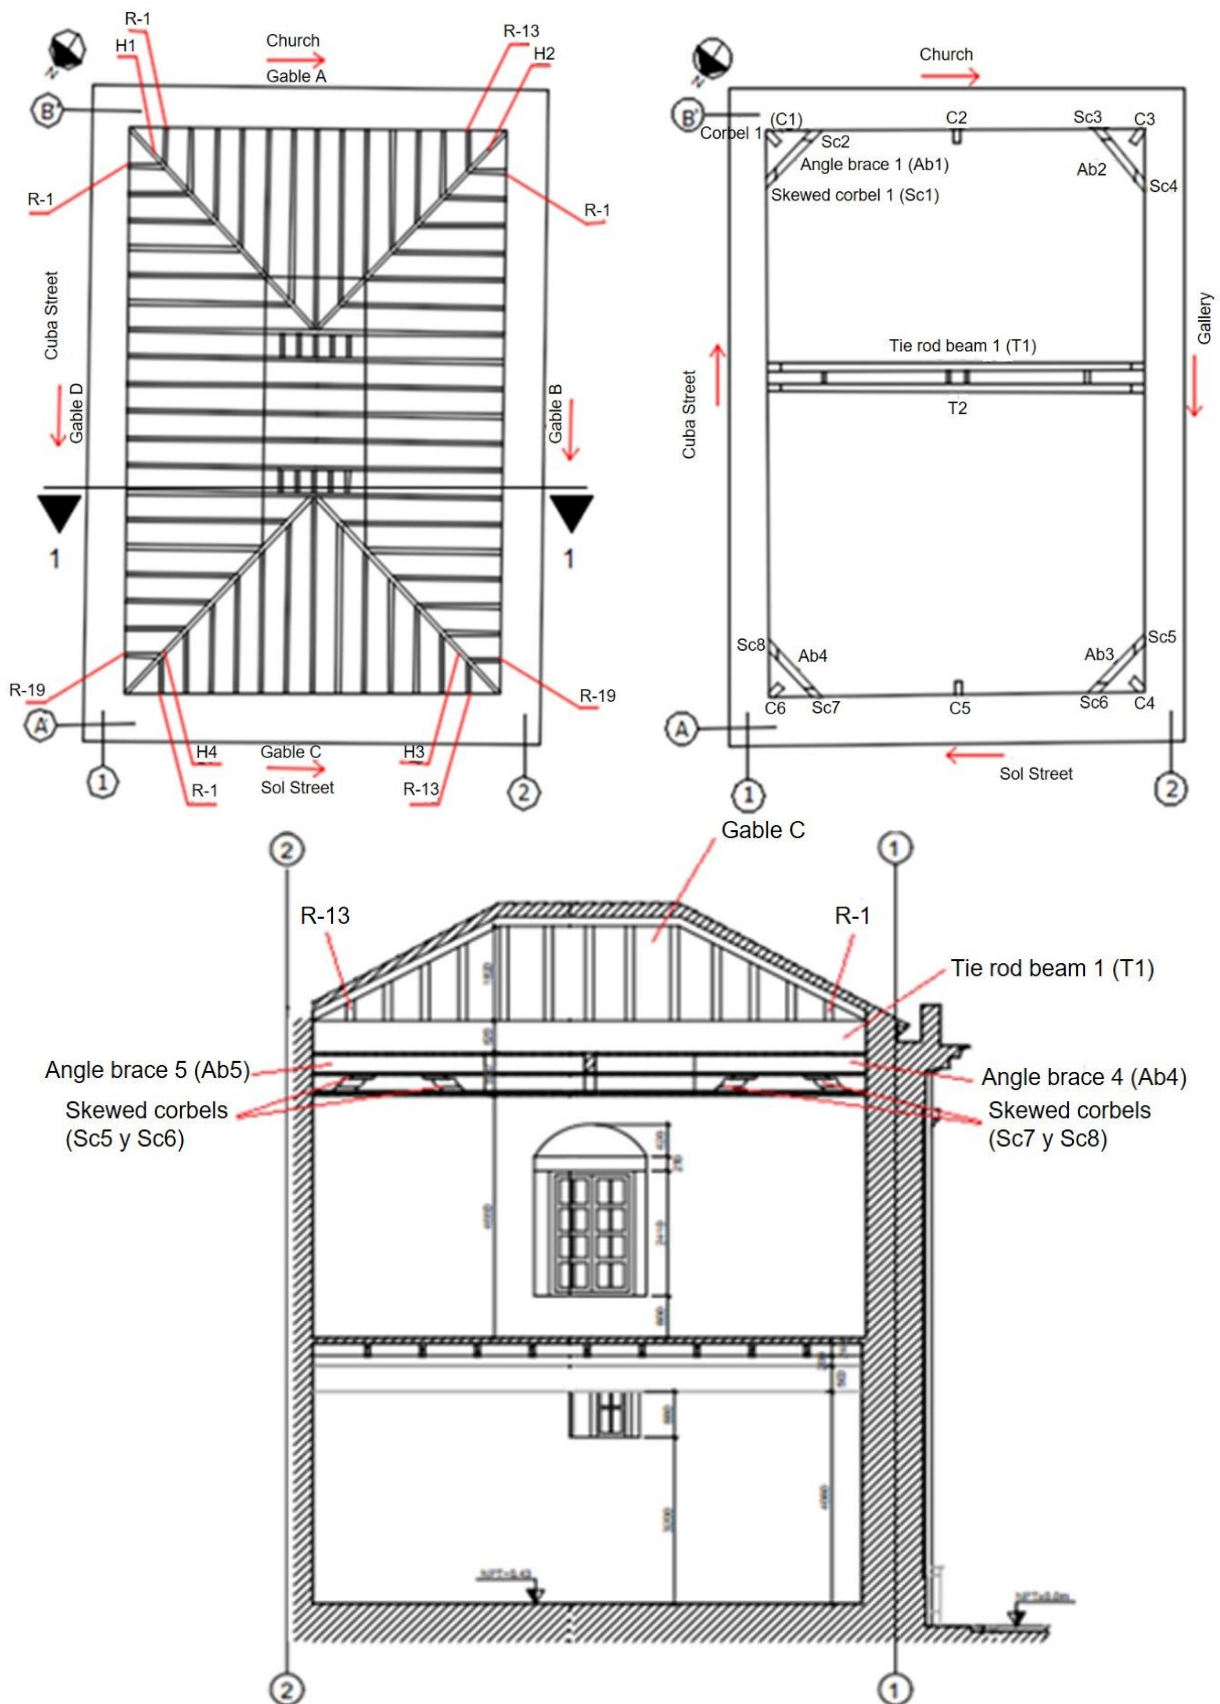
Nomenclature and numbering of the elements at the High Choir in an architectonic plan and in a cross section 1-1.
